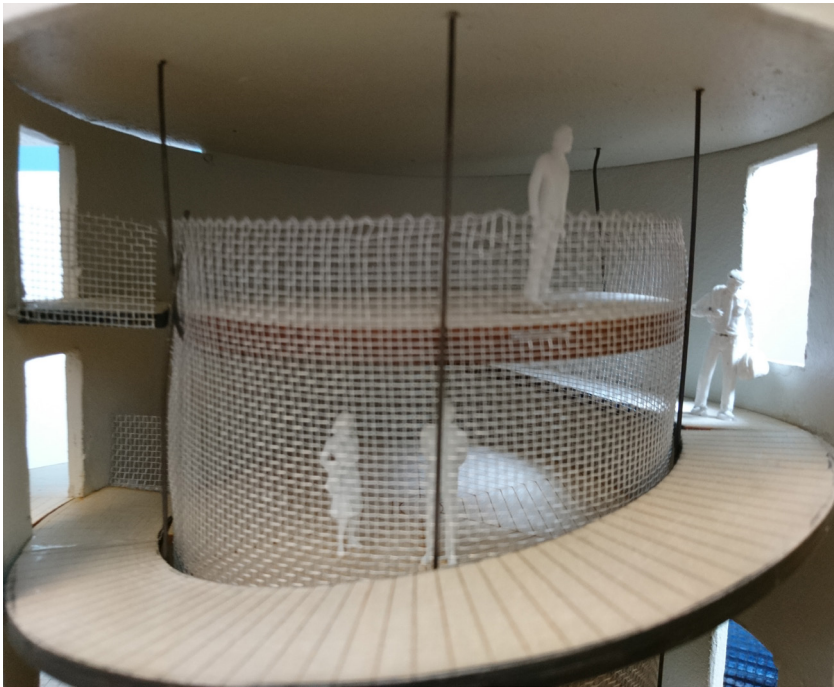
A hanging mesh exhibition-space with the ramp descending around.
